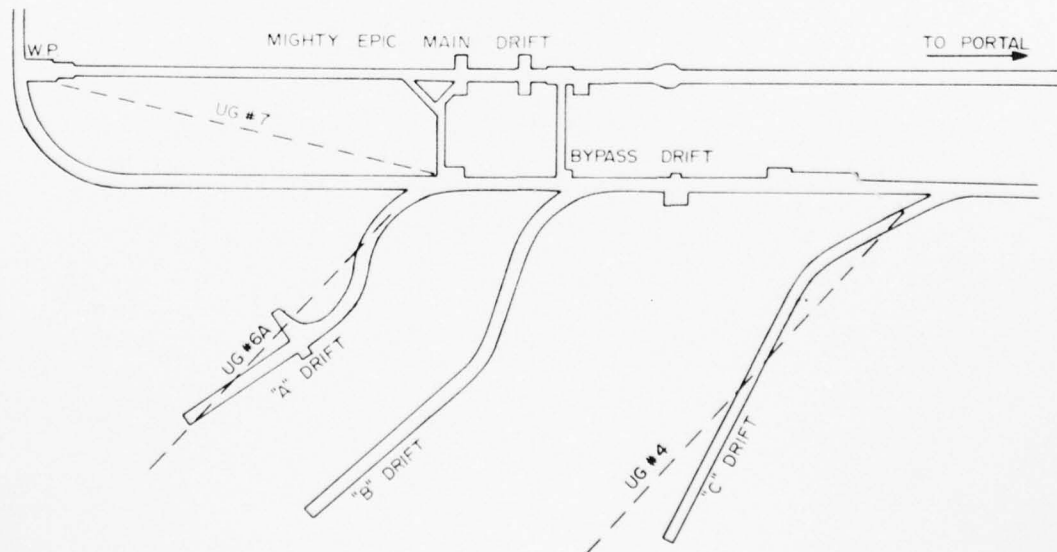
Plan View of the Mighty Epic Tunnels and Selected Drill Holes
